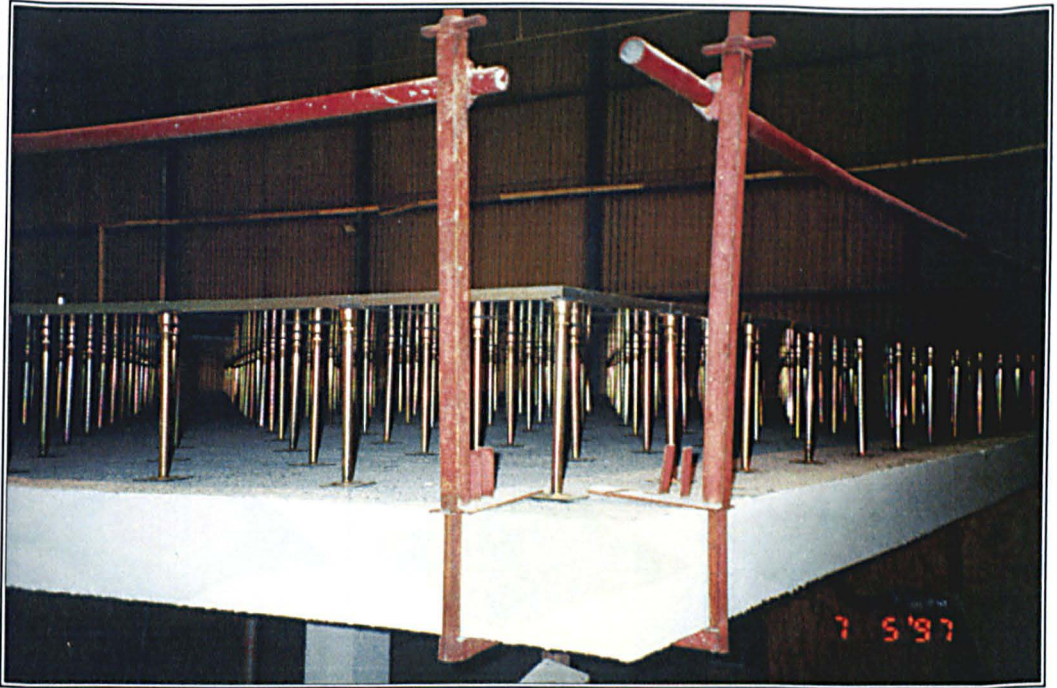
Structure B - General View with Access Floors Installed (Configurations 2 and 3).
